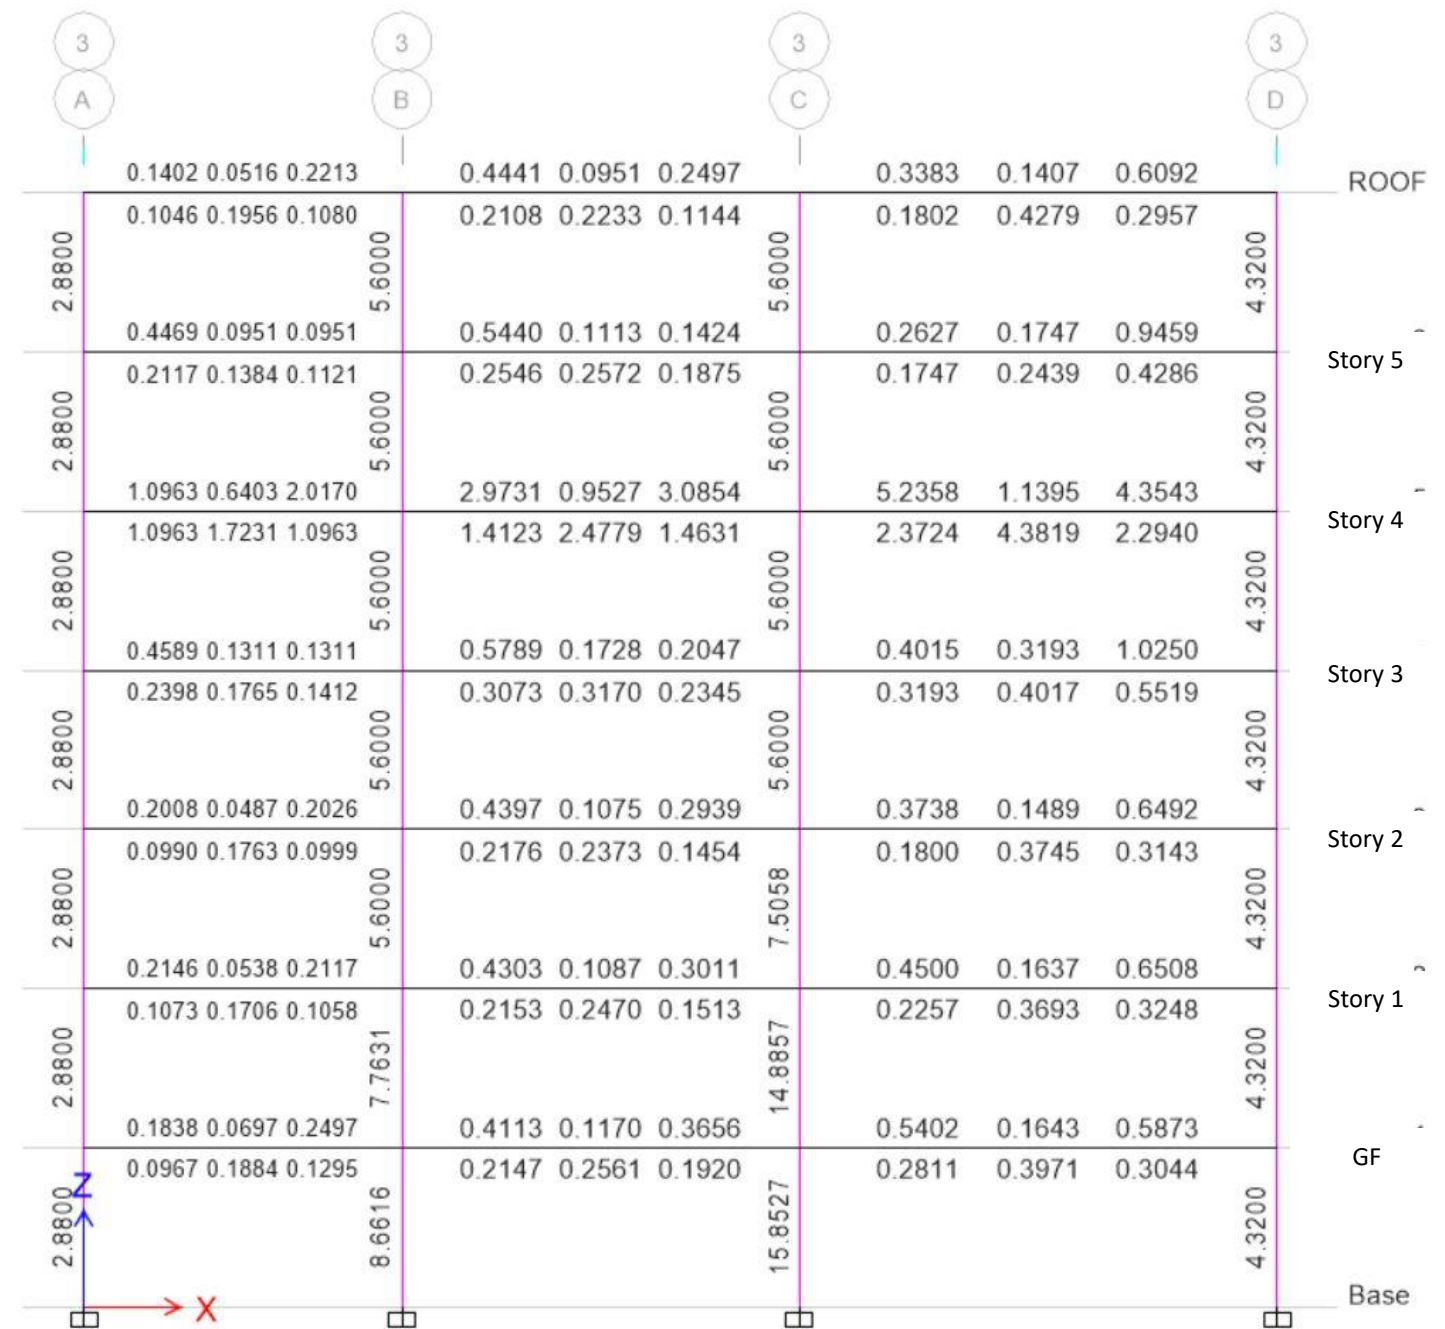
Grid 1 Beam Longitudinal Reinforcement
